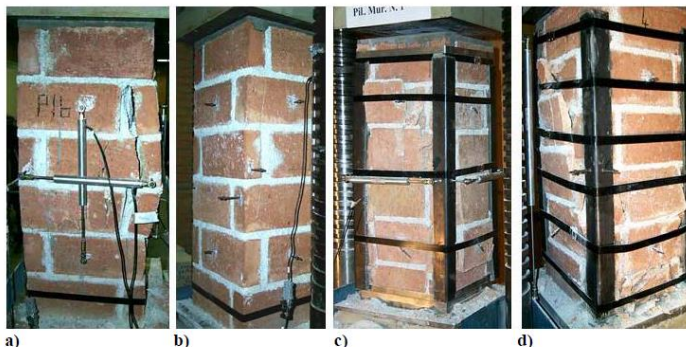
Column specimens under tests: a) typical failure mechanism of unstrengthened specimens due to brick layer instability, b) failure of column 1 before strengthening, c) failure of column 1 after strengthening, d) failure of column 6.
